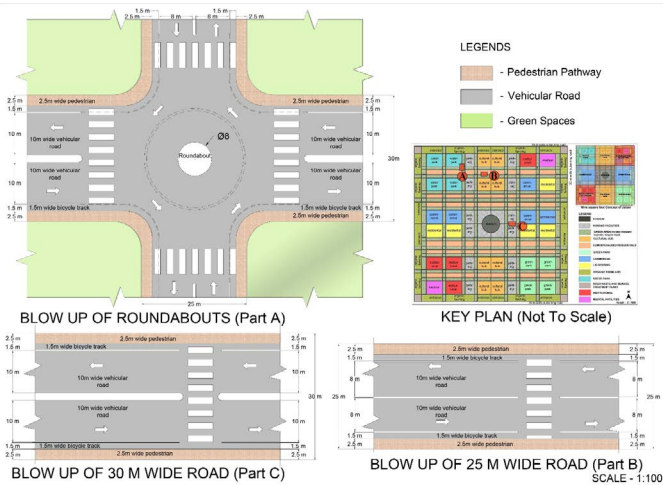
The blow up plans of one of the Roundabouts, 30 meters wide road and 25 meters wide road (source – author)
